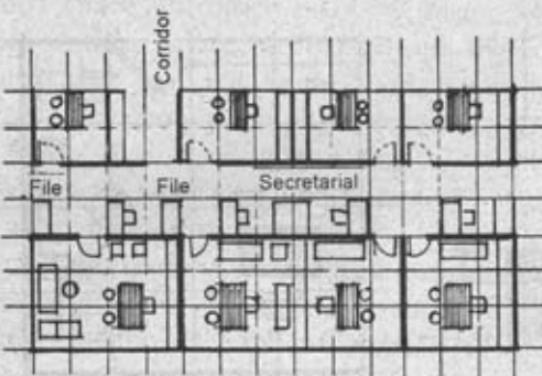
TYPICAL MODULAR PLANNING FOR PRIVATE OFFICE WITH SECRETARIAL AREA
